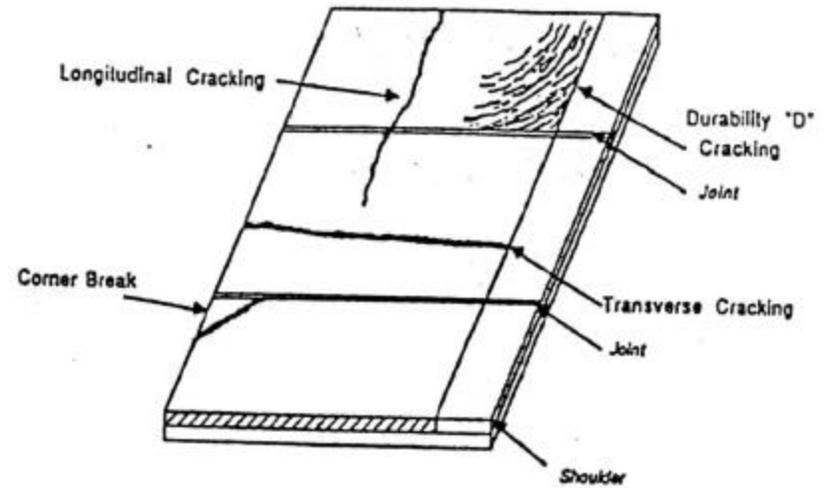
Sketches of Typical Distresses in Jointed PCC Pavements.
